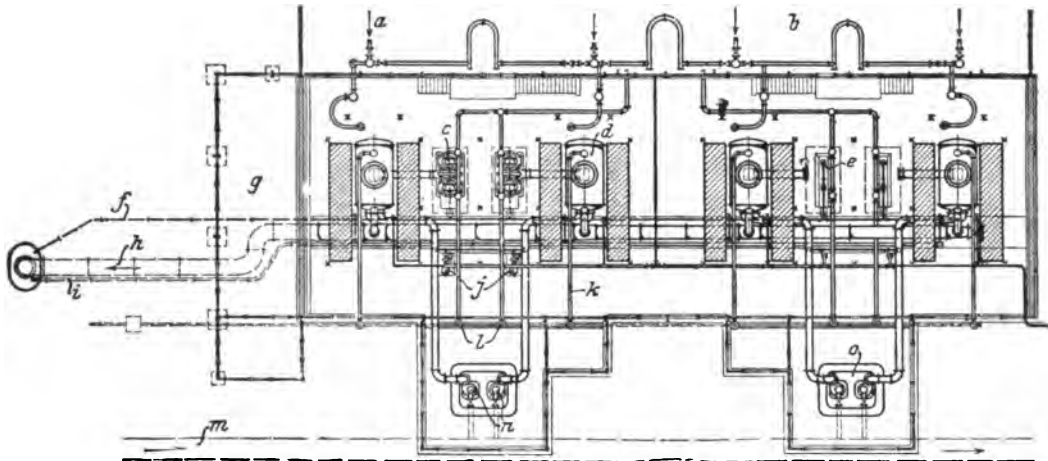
Simmerpan Power Station. Plan of Pipework and Condensing Plant.
